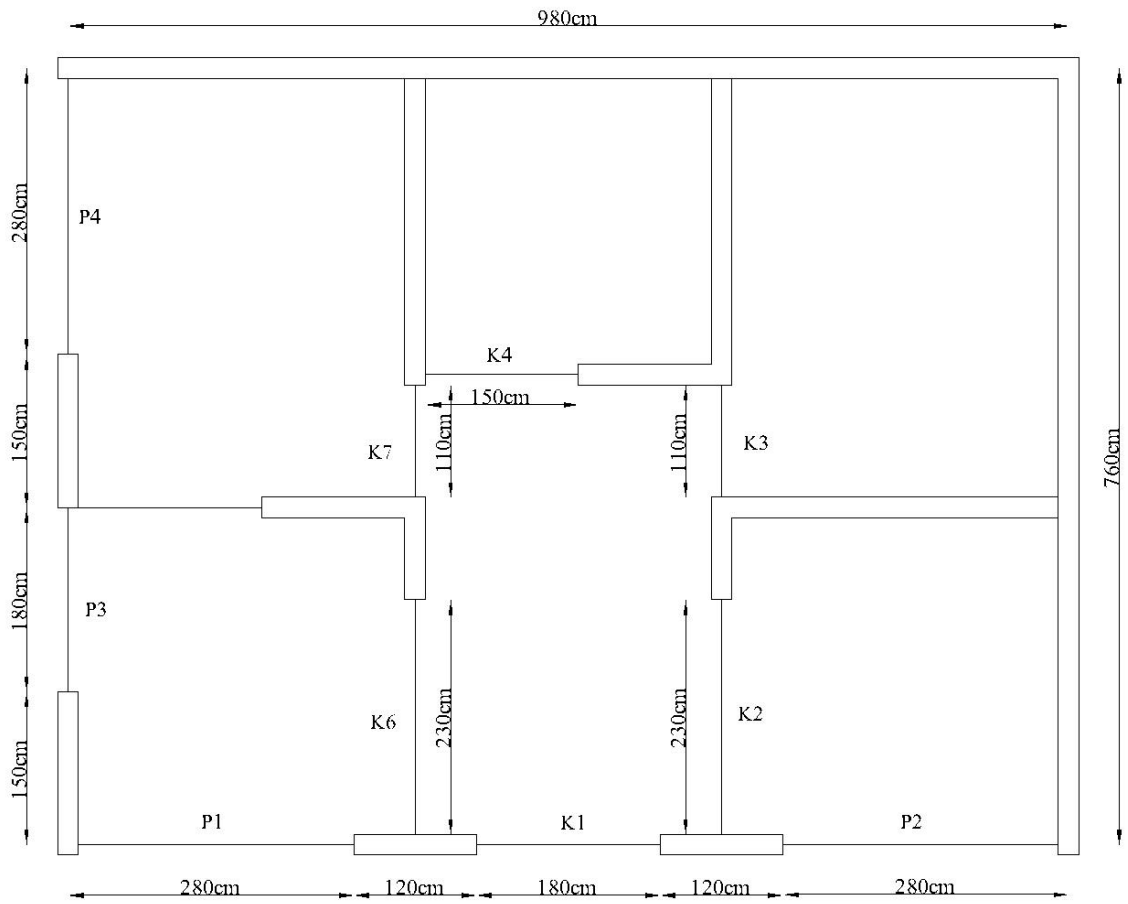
5. Plan geometry of the masonry building model of R2W2 subclass.
